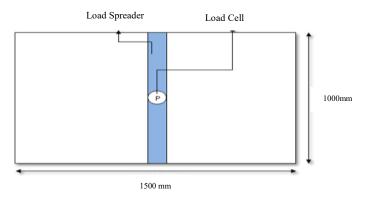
The Plan View of SFRC Ribbed Slab (source by author)
